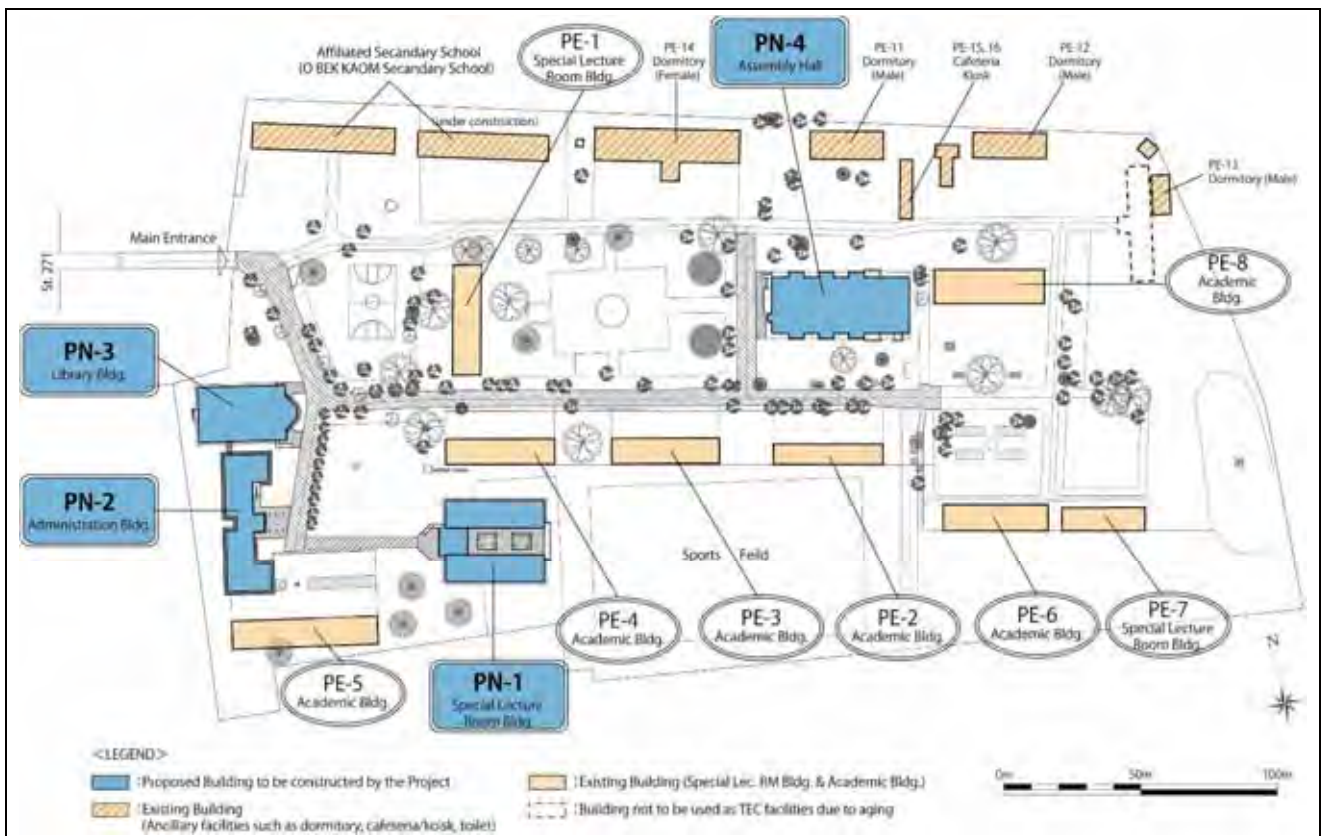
Proposed Site Layout for Phnom Penh TEC
